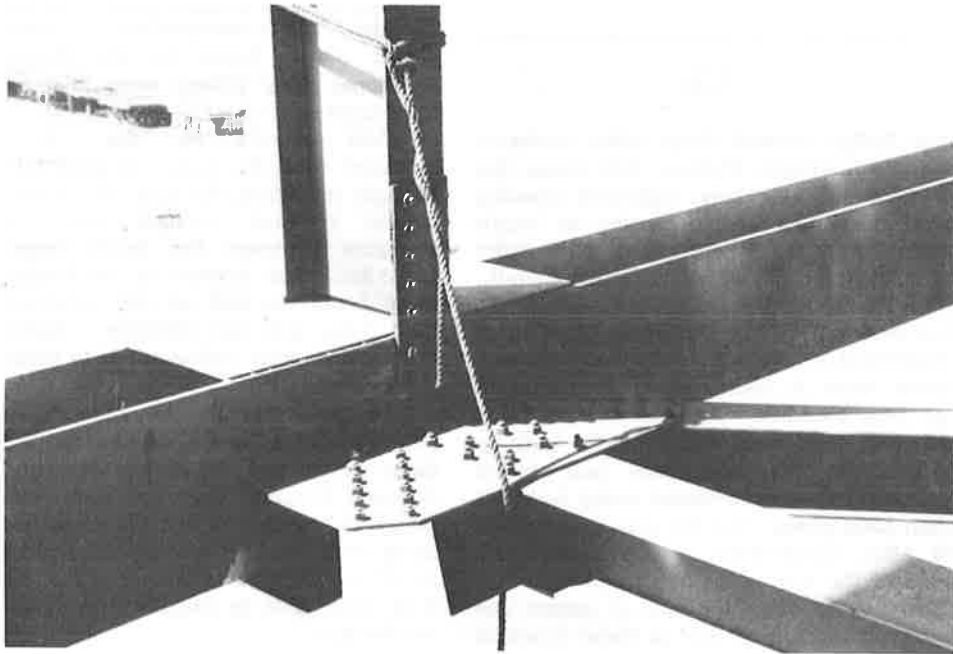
Stay plate welded to flange, at a T-joint.
